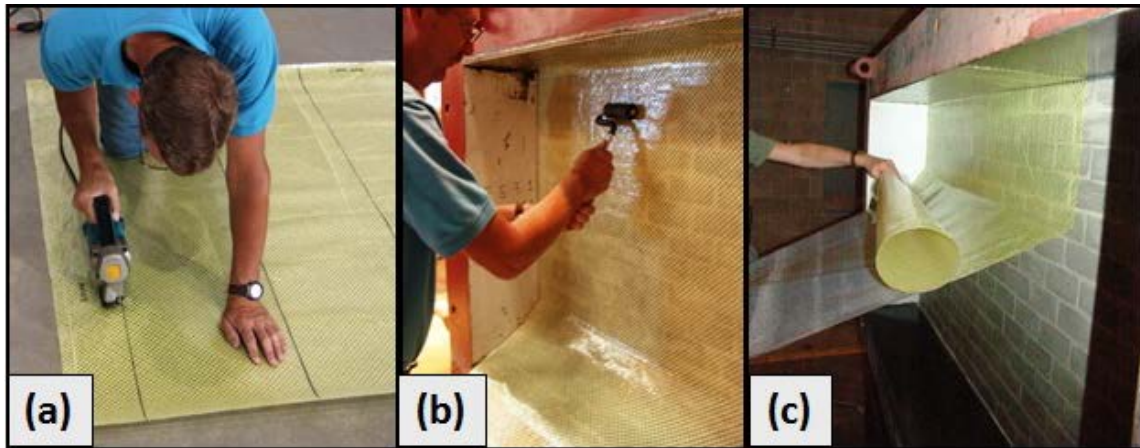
Reinforced film. (a) Film cut to size using mechanical shears. (b) Rubber roller used to apply pressure to film. (c) Backing paper removed as film application continued.
